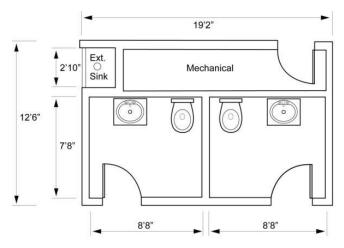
Concept floor plan for a stand-alone bathroom with exterior sink.
